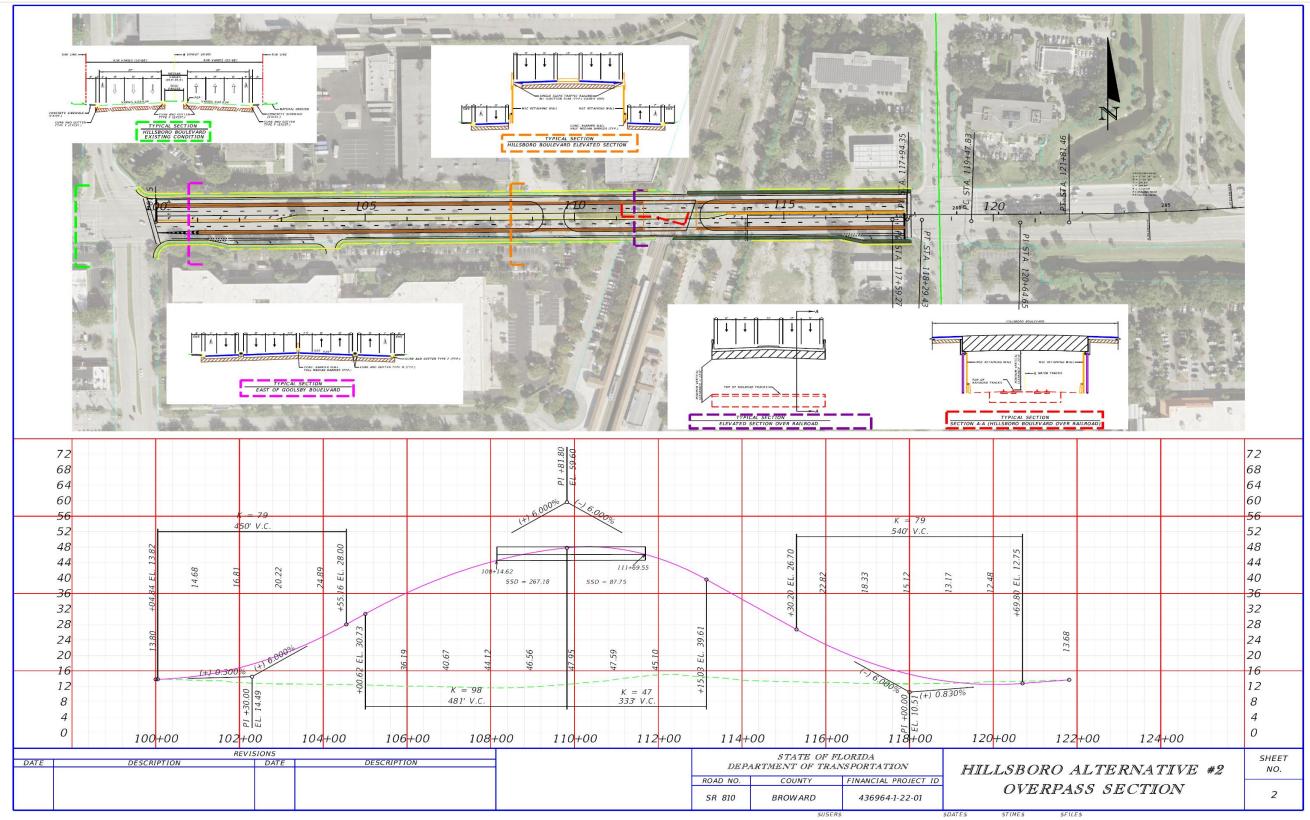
13: Hillsboro Boulevard - Concept Plan - Alternative 2
